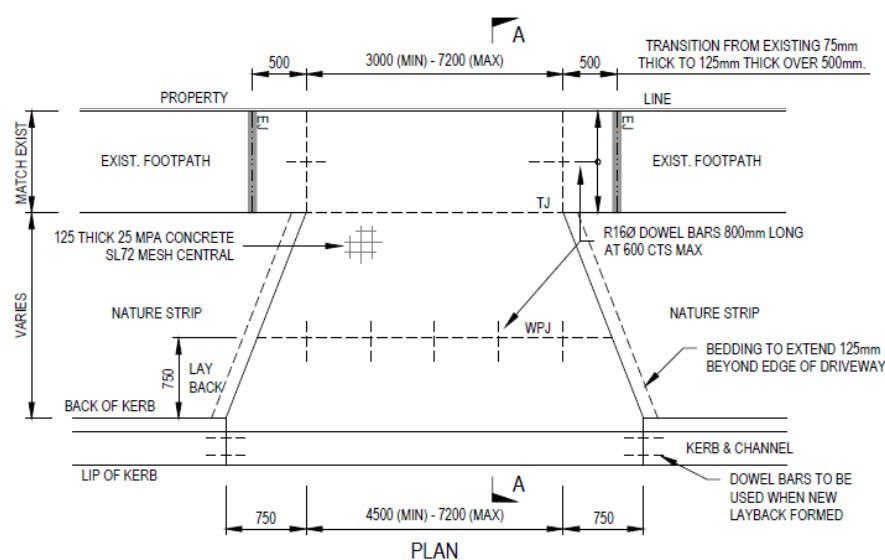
Crossover Requirements – IDM Standard Drawing SD 235
